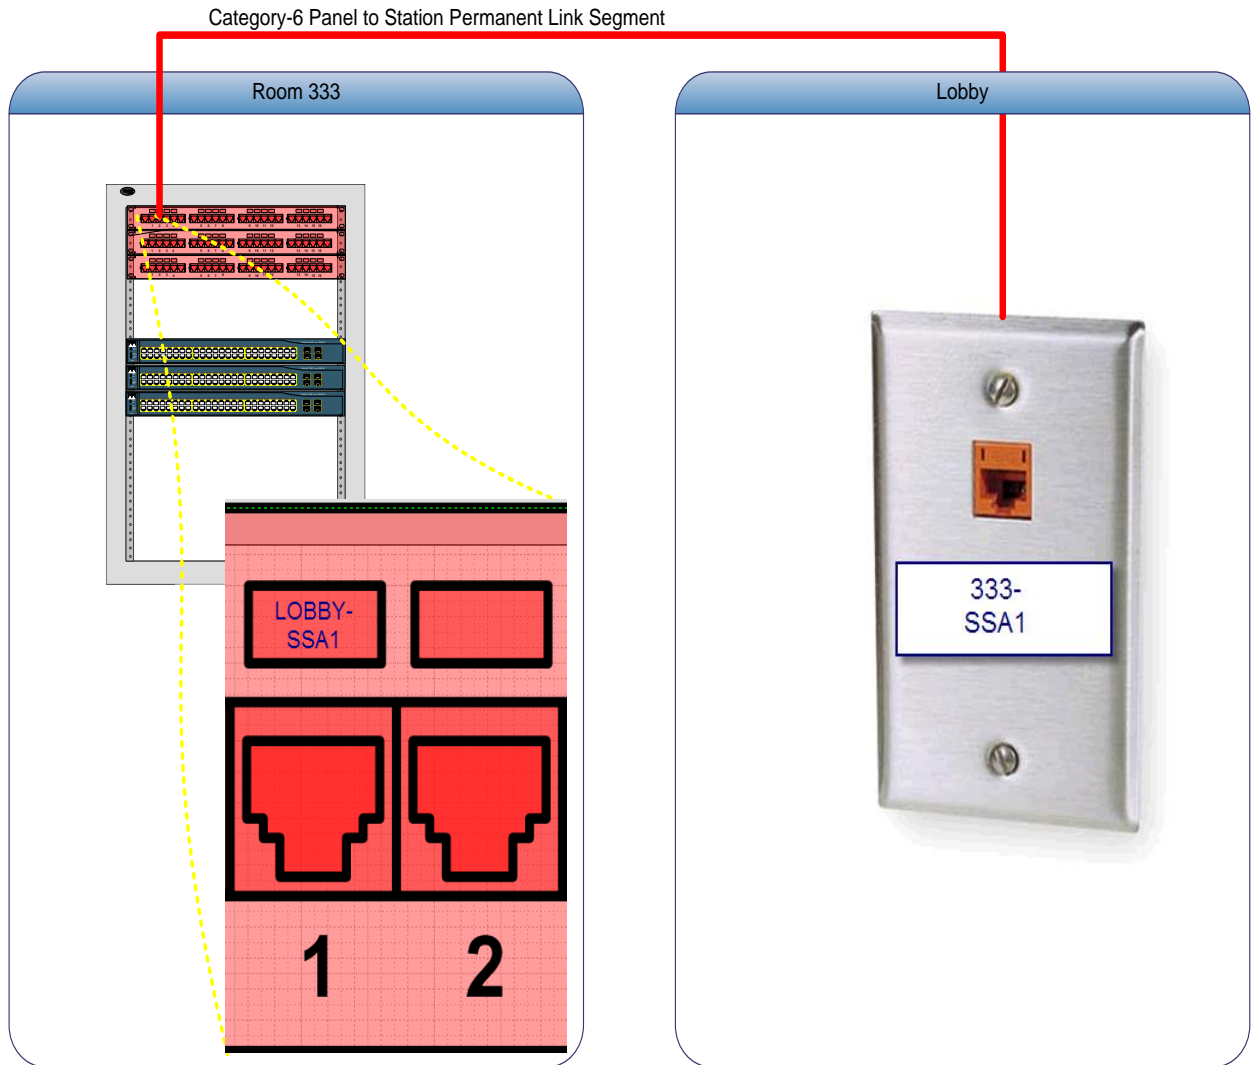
Sample Labeling: Patch Panel to Workstation Faceplate
